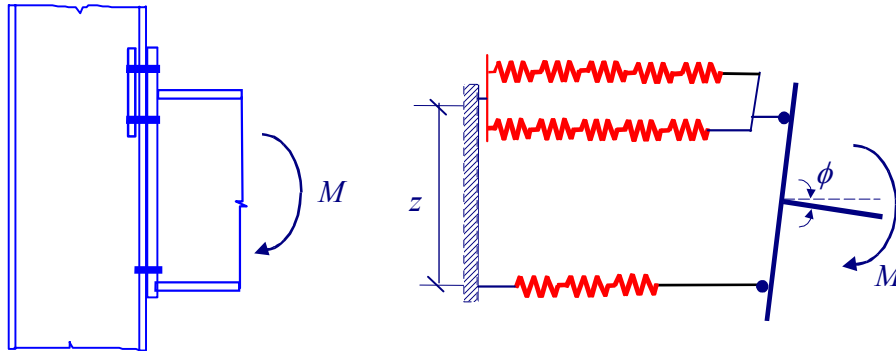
Component method applied to a typical beam-to-column joint, a) joint, b) component model
